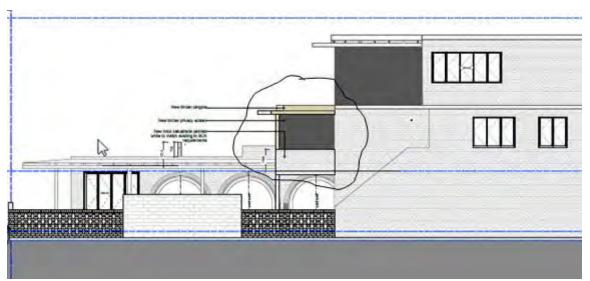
excerpt from proposed Northern Elevation (Revision B 28/11/2014)
